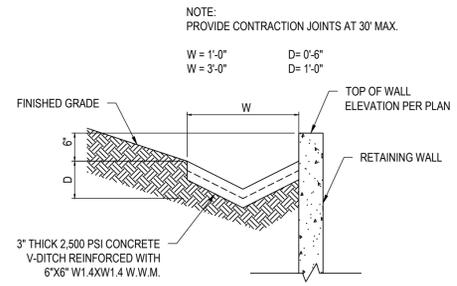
DETAIL CHANNEL DRAIN 6 NOT TO SCALE
